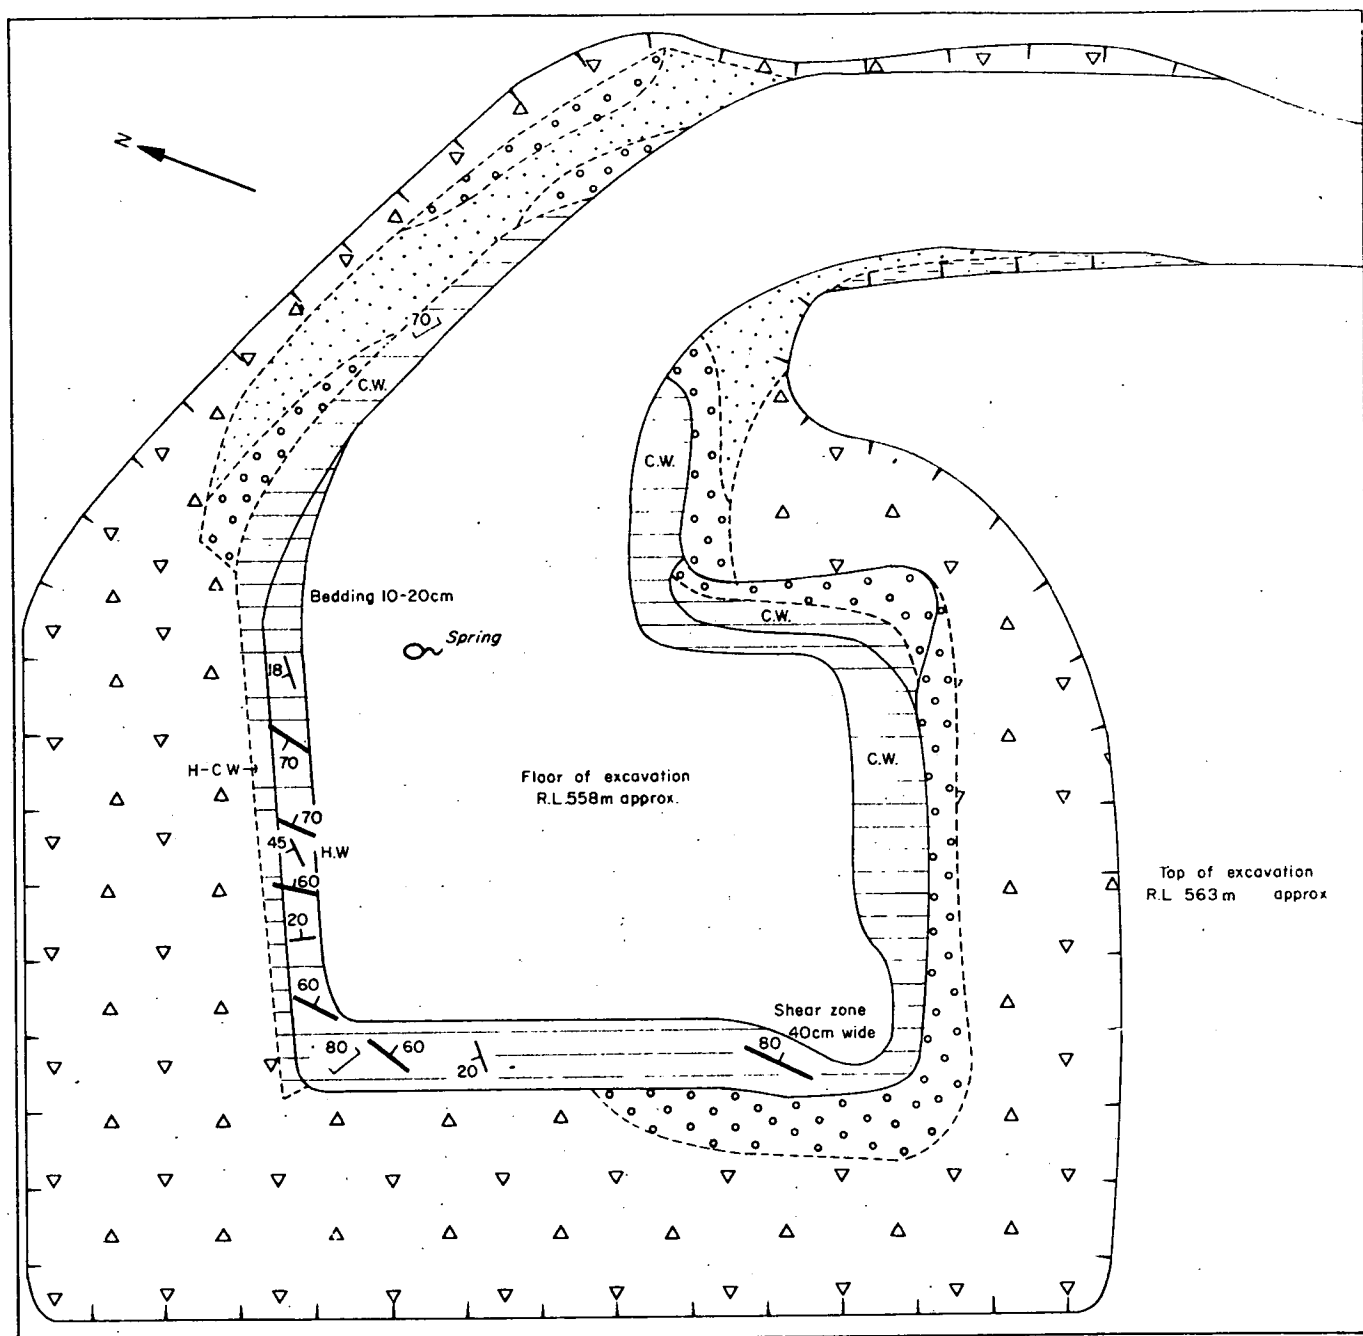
GEOLOGICAL PLAN OF EXCAVATION D.C.T. BUILDING SITE, CANBERRA
